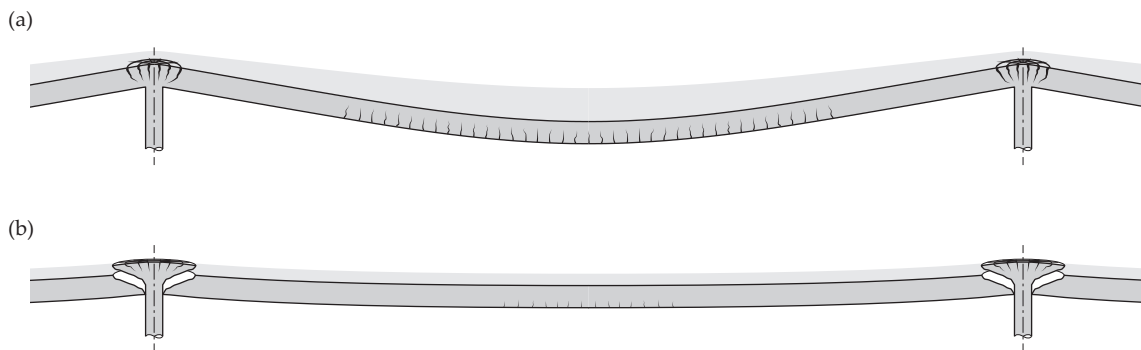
Potential failure modes of flat slabs: (a) flexural failure; (b) punching shear failure
